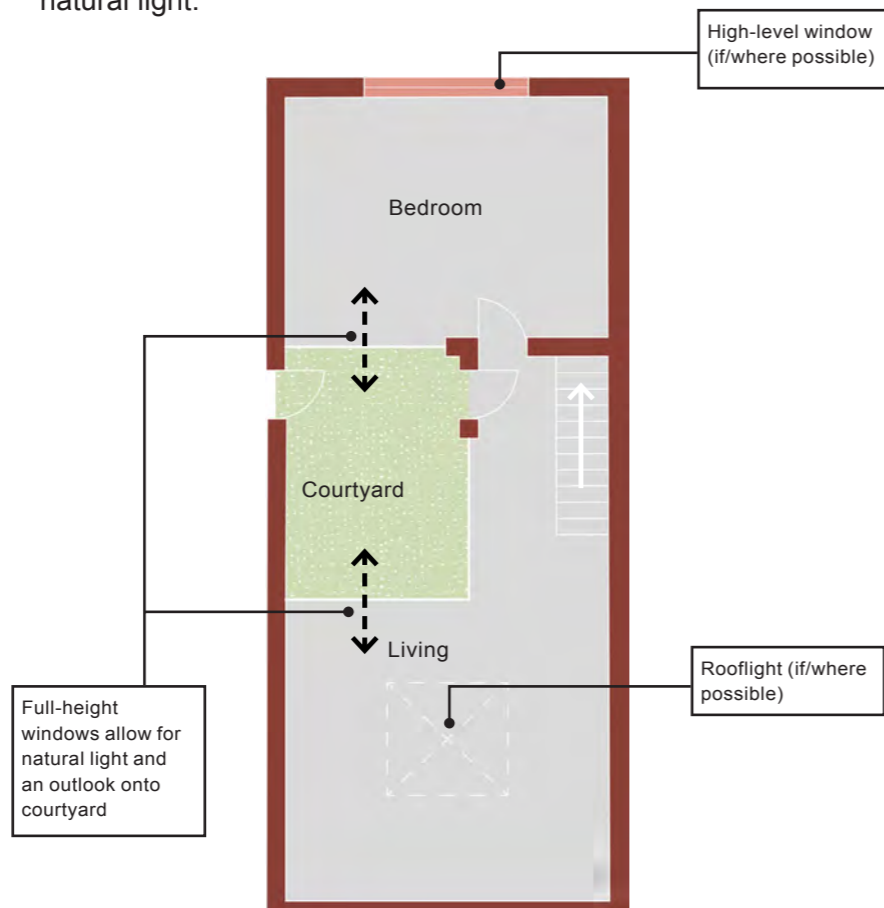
Diagram illustrating solutions to access natural light on a constrained site that limits externally facing windows.
